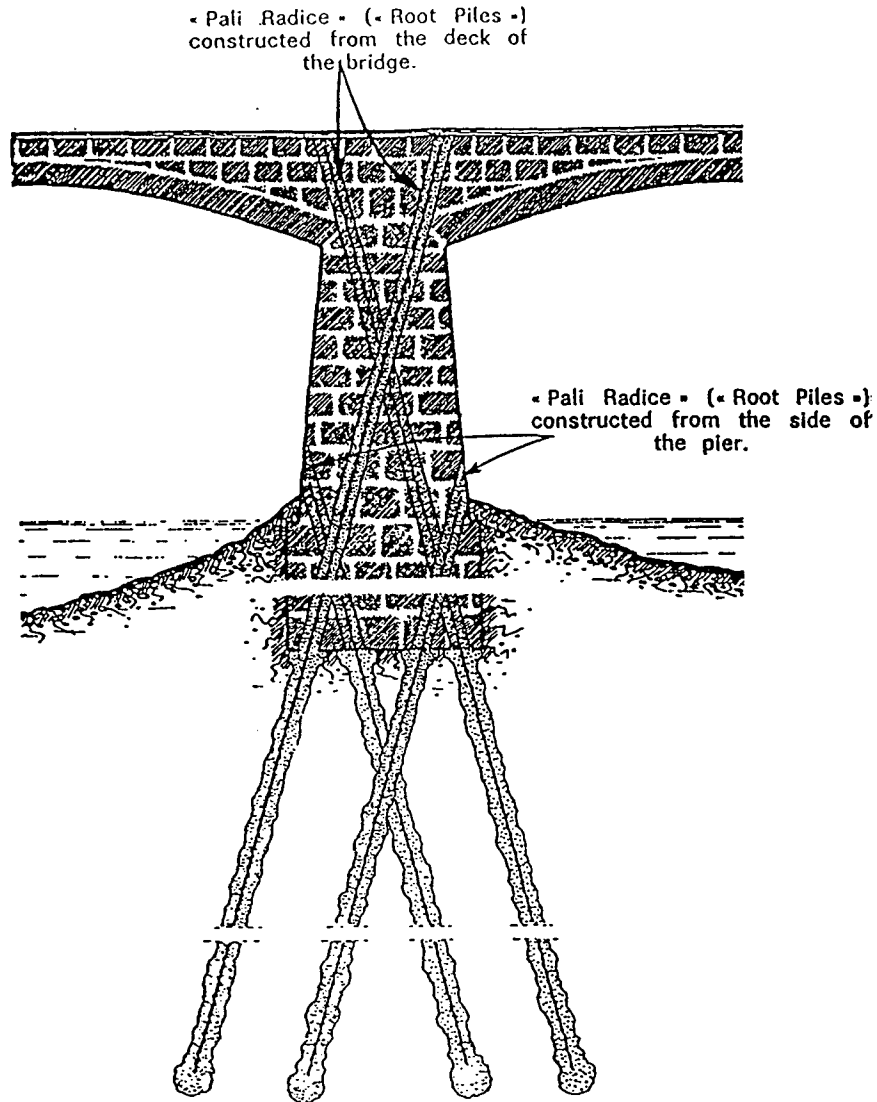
Underpinning of a bridge pier in Italy by root piles (Lizzi, 1971).
